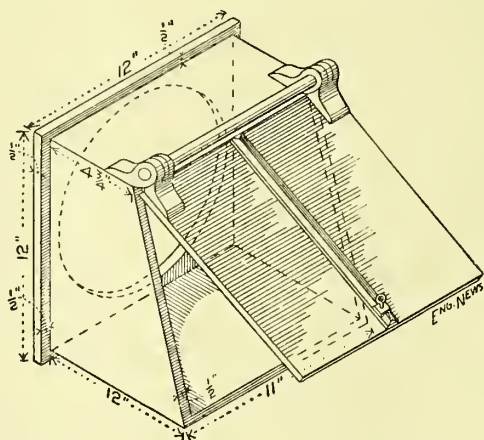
GATES ON OUTLET PIPE FROM TANK.
